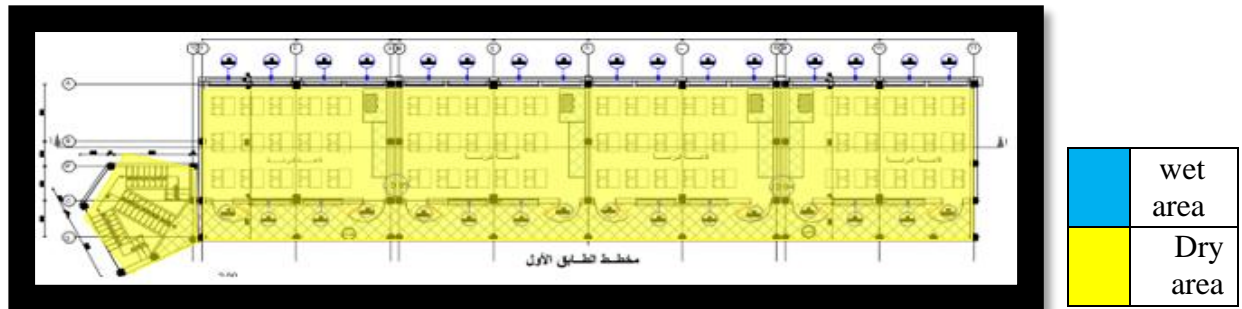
feild feature in the first floor ,Source : first floor plan adapted by the author2025
